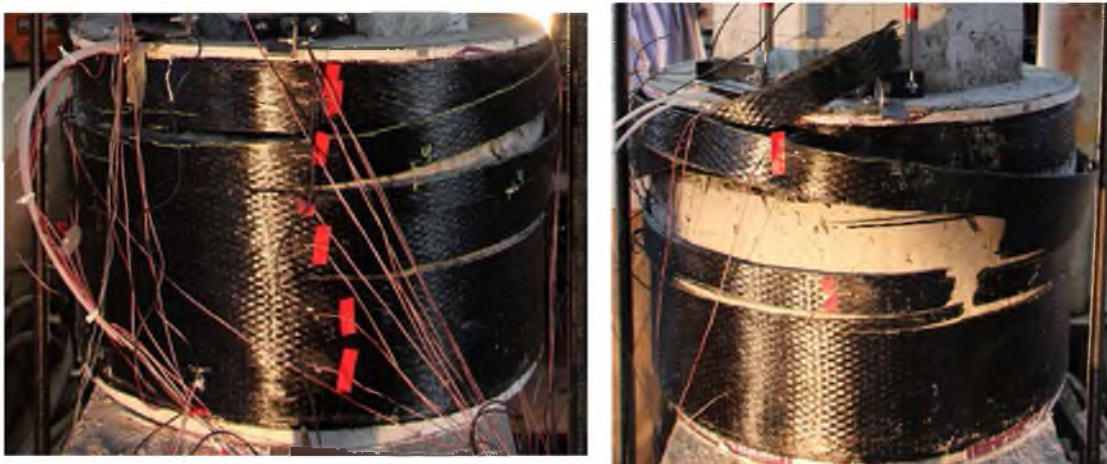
PCLen-3R Second Jacketed Fracture: (a) West Side of Jacket; (b) East Side of Jacket
